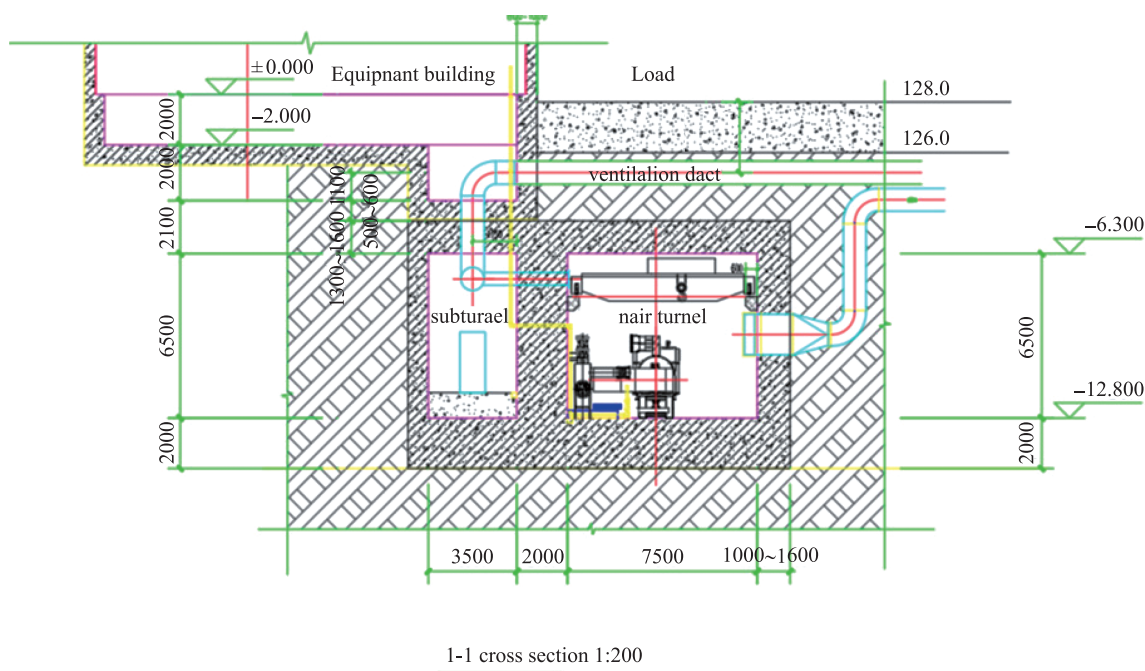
(color online) Cross-section of Linac with surrounding soil and concrete structures.
